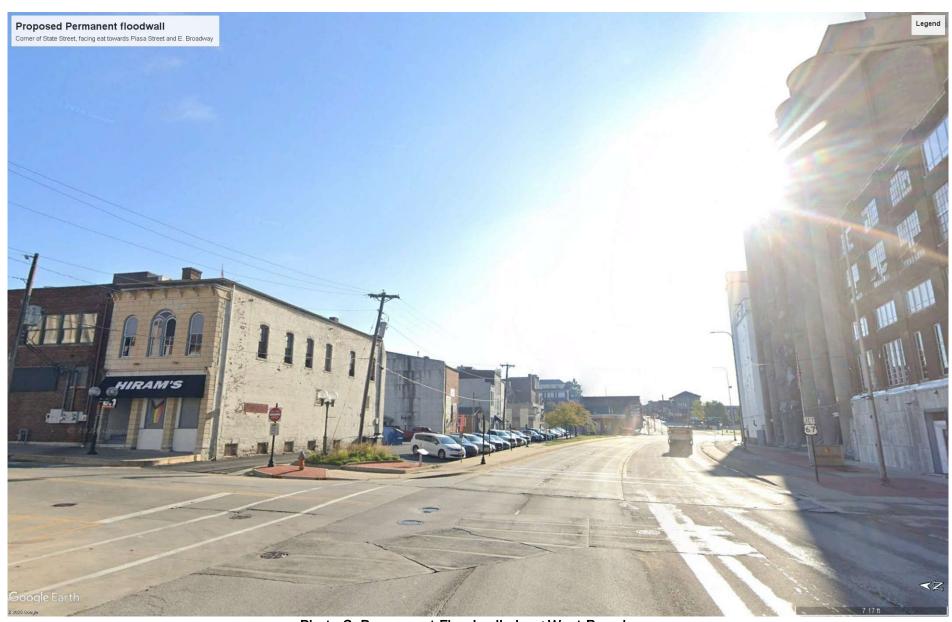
Permanent Floodwall along West Broadway, starting at the corner of State Street and Sugar Alley; facing east
